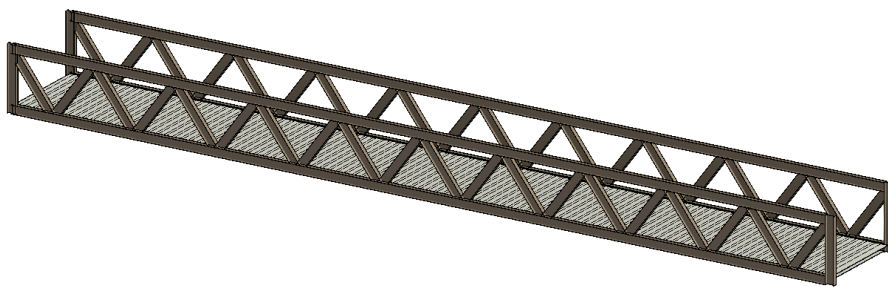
Bridge deck supported on a longitudinal load-carrying structure.
